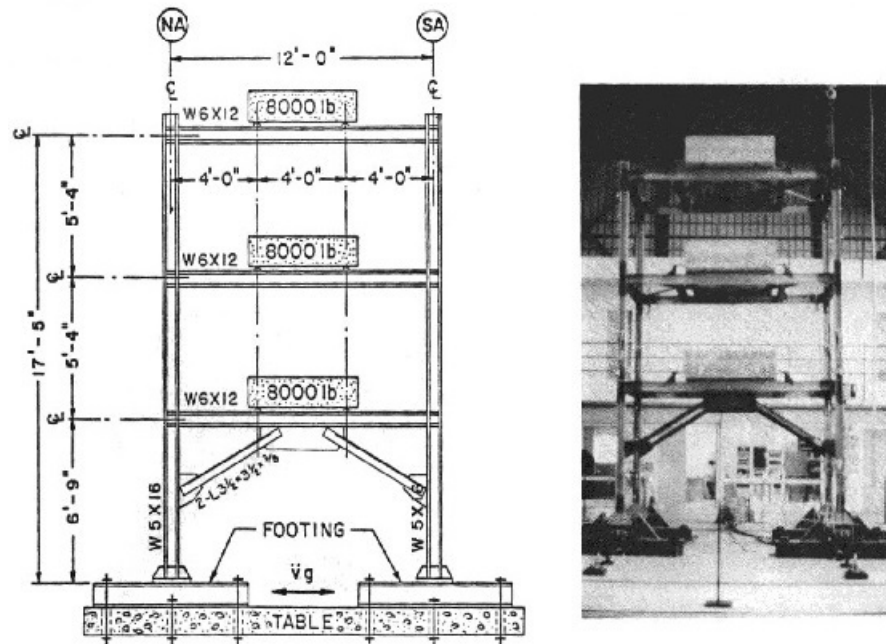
Elevation view of a rocking frame structure (from Clough and Huckelbridge 1977)
